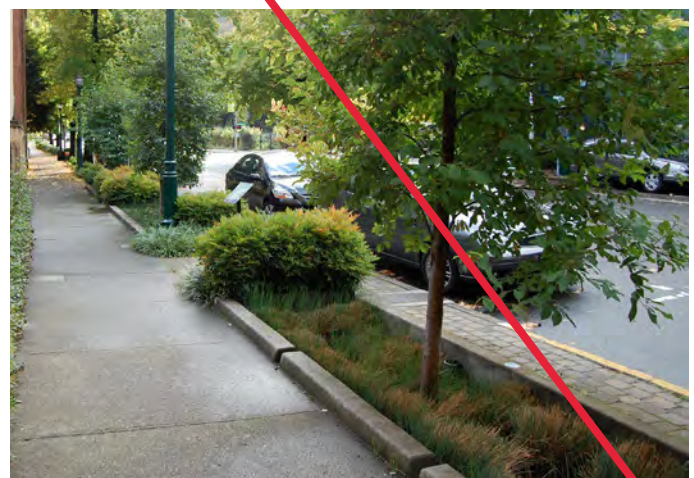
(2). Curb Cut and Landscape Storm Drainage Methods
